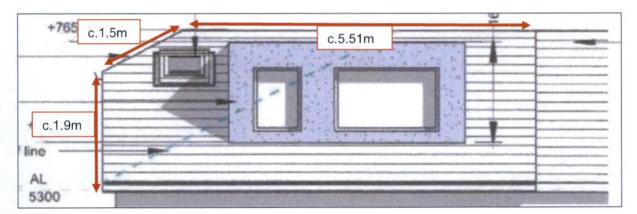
Original rear elevation showing roof dimensions approximately.
